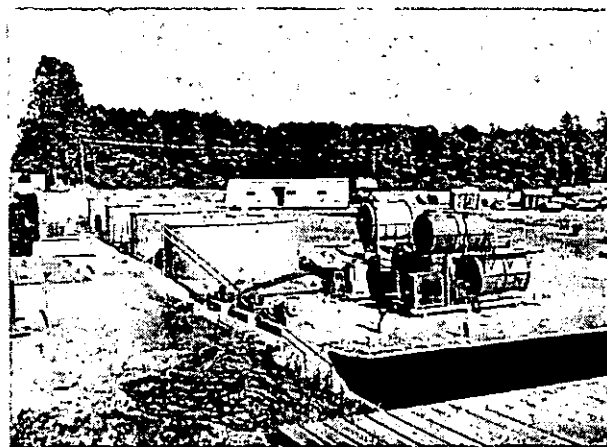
View of batch mixers, storage tanks, and loading pumps during installation.
